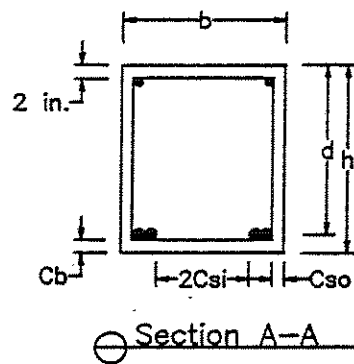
Splice test specimens group 22 (1 in. = 25.4 mm)
